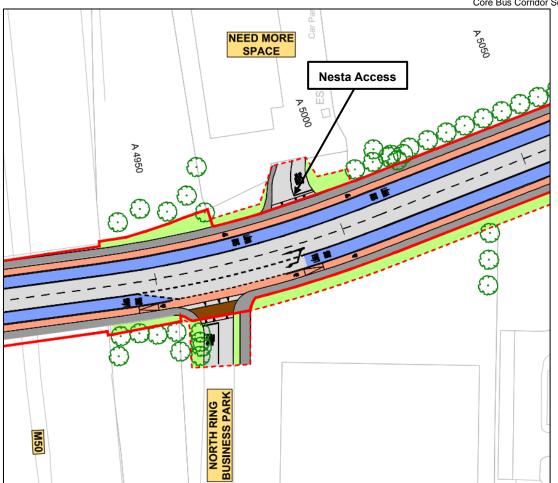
General Arrangement of Proposed Scheme at Nesta Storage (Sheet 14)
